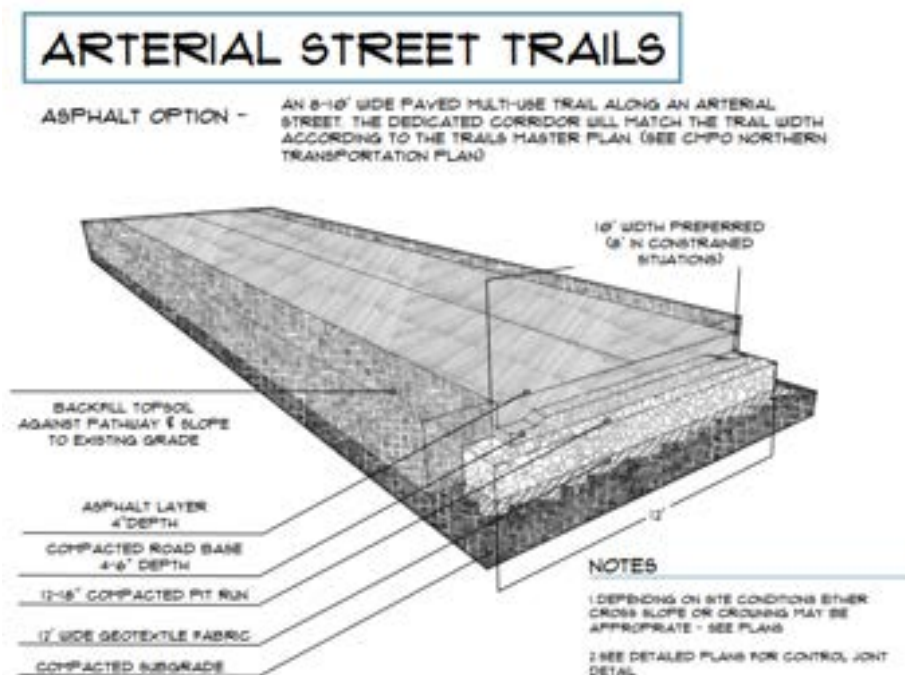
Arterial Street Trail Cross Section, (Hyde Park City & Cache County, 2022)
